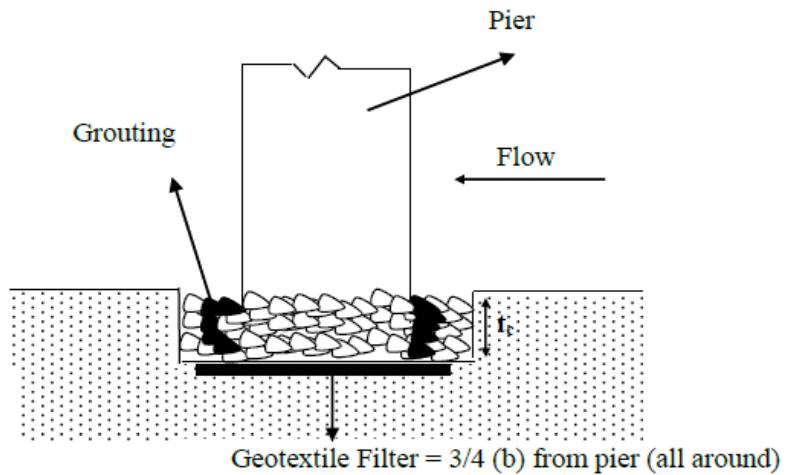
Details of geotextile filter placement (Lagasse et al., 2007)
